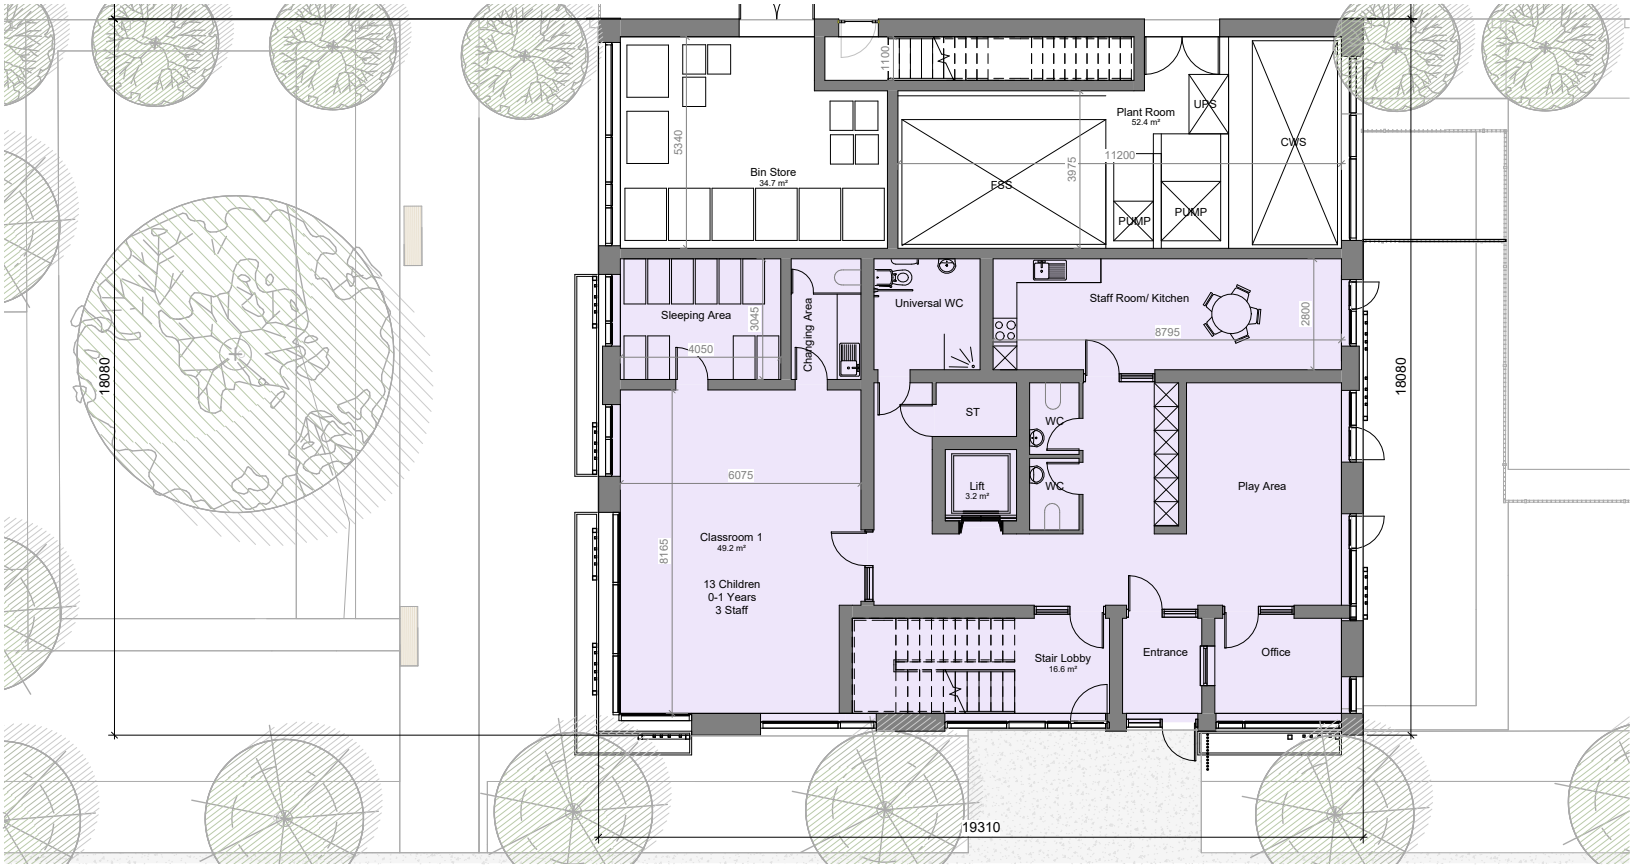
Ground Floor Level Creche, Block A Source: MCORM, 2026.
